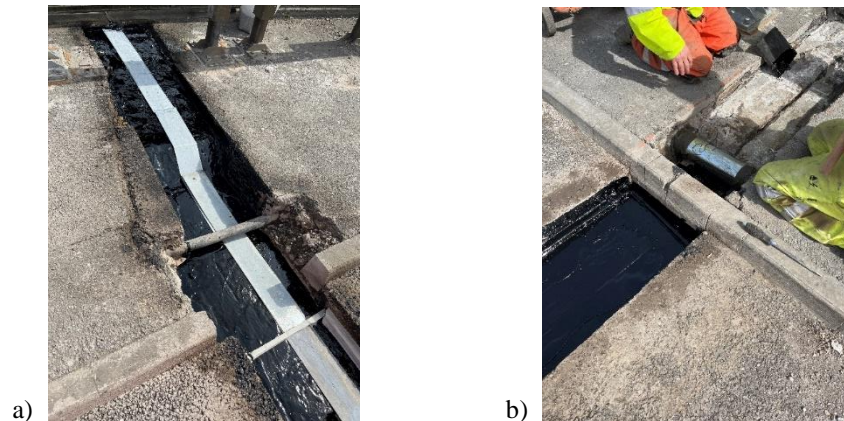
Case study of a bridge with unexpected service duct, a. Unexpected service duct found during asphaltic plug joint replacement construction works, and b. Installation of steel protection to service duct before pouring of hot bituminous material.
